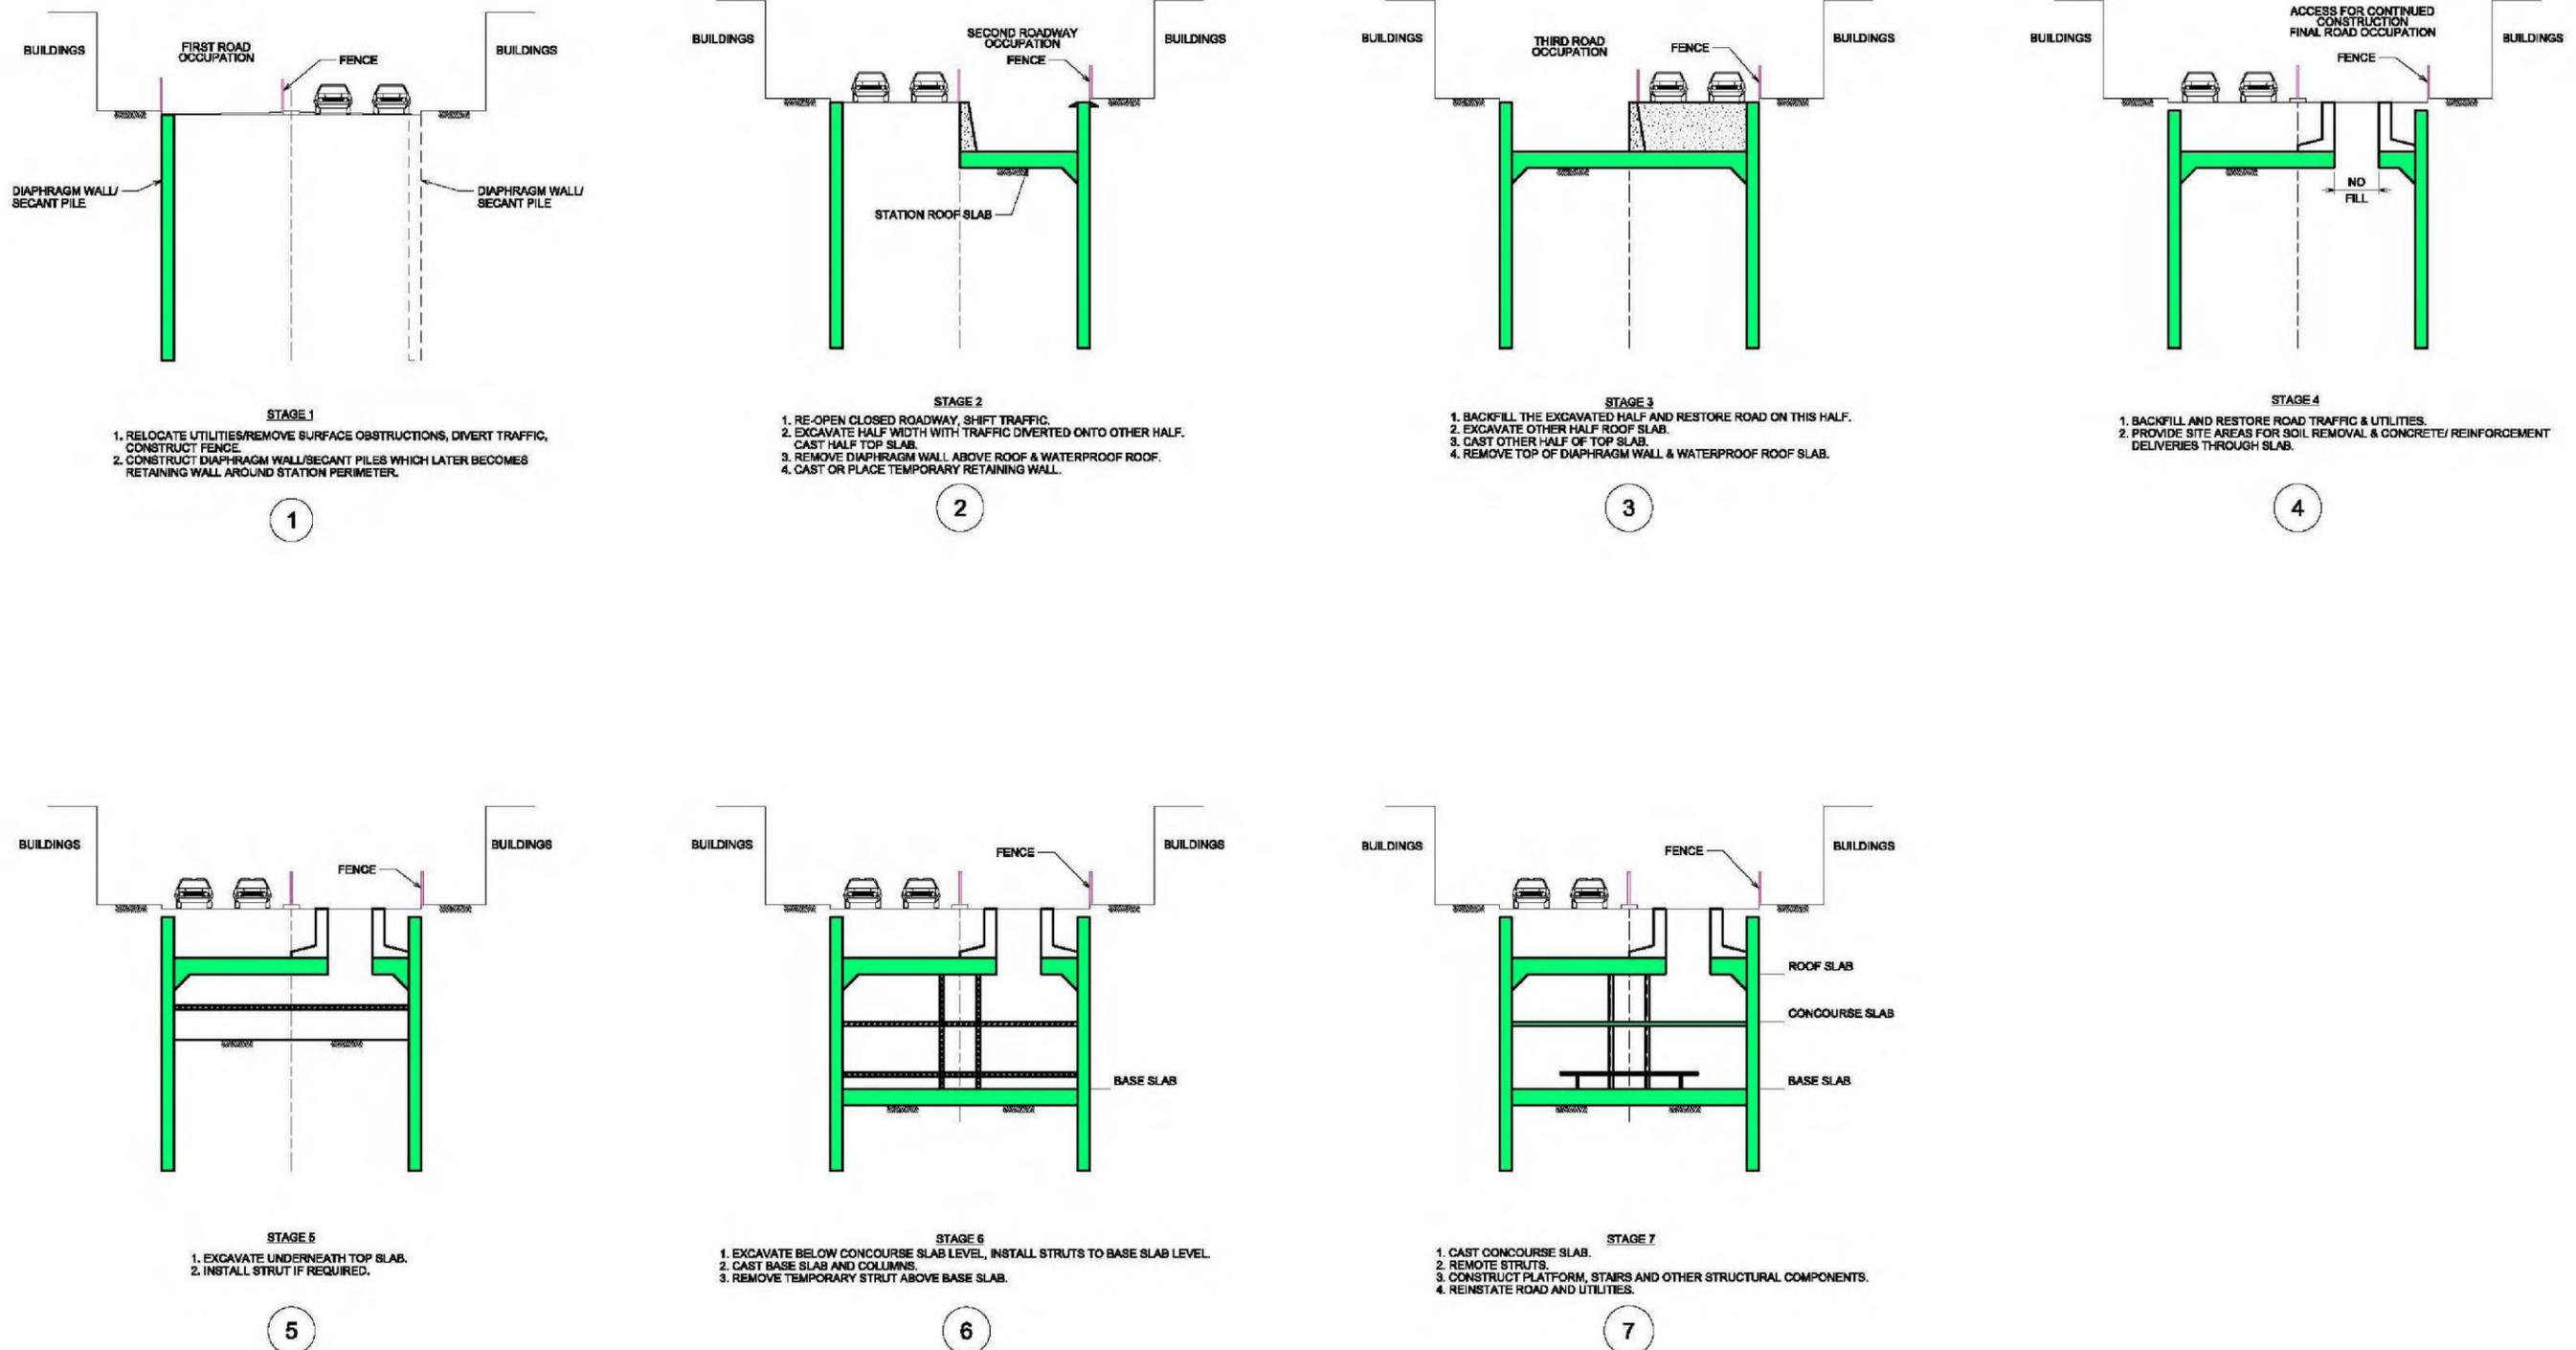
Station Excavation and Construction Method using Cover and Cut (Top Down)
